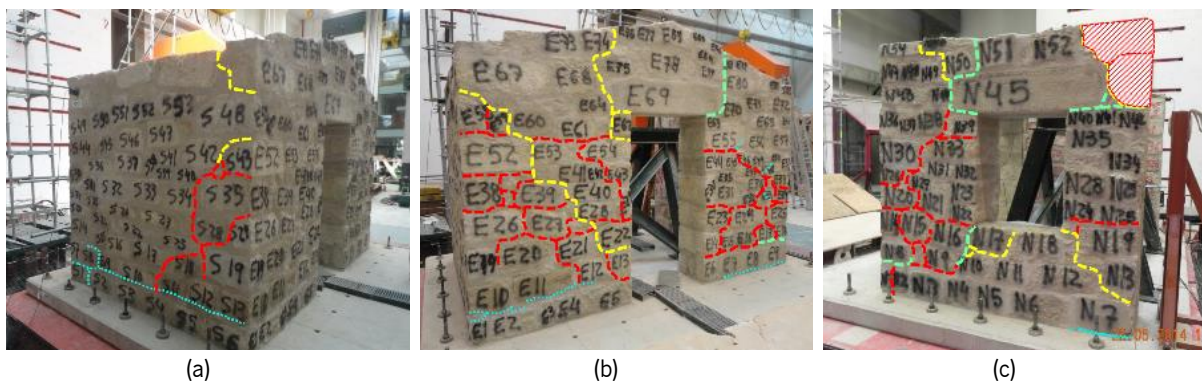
Collapse mechanisms of the stone masonry prototype from shaking table tests: (a) return wall without opening, (b) main gable wall, and (c) return wall with window opening
